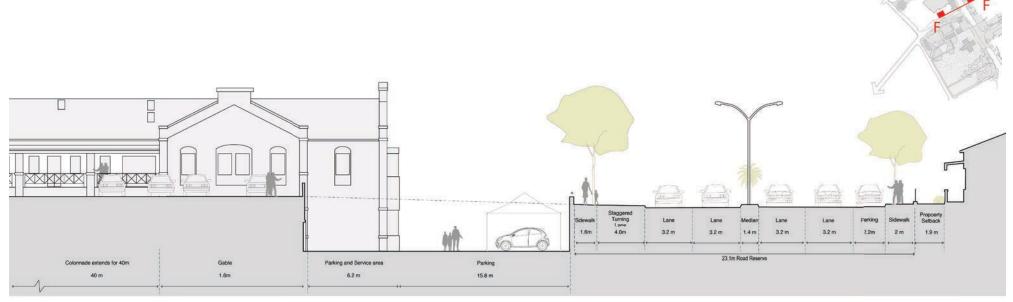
CHURCH AND TOURIST GATEWAY PRECINCT
